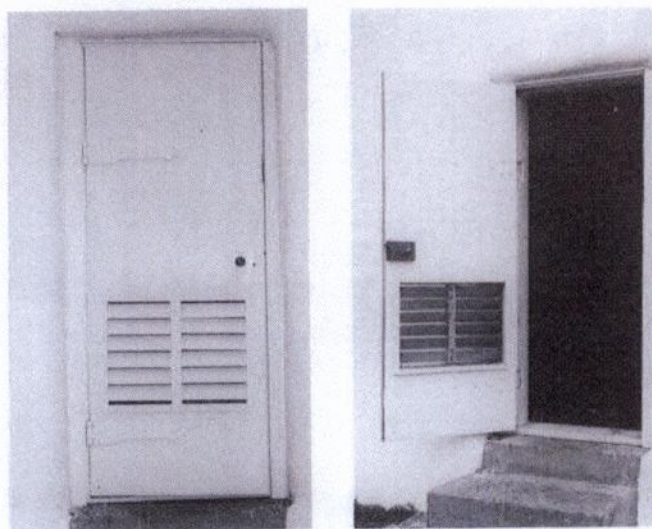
If historic doors would be damaged by adding extra locks, they should be removed and stored and new security doors added. At this lighthouse, the historic door has been replaced with a new door (seen both inside and outside) with an inset vent and new deadbolt locks. The heavy historic hinges have not been damaged. Photo: Williamsport Preservation Training Center, NPS.
